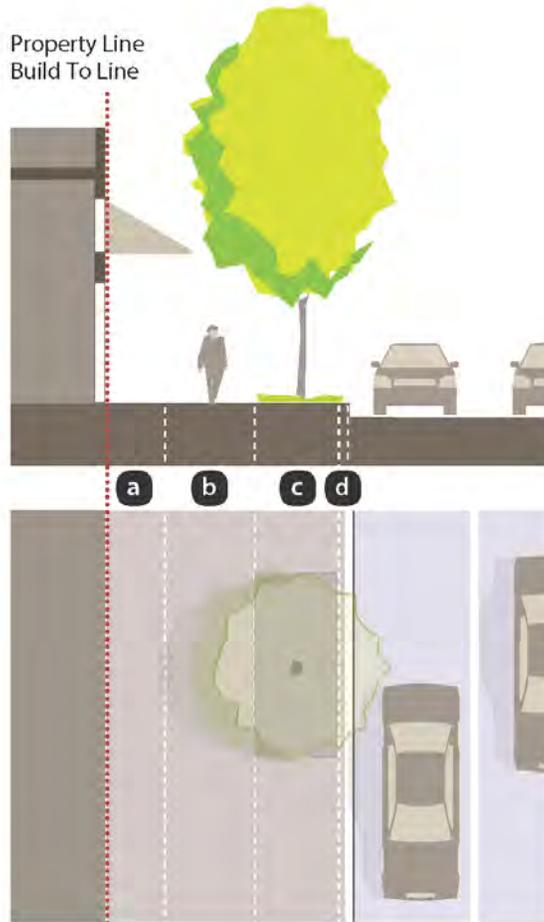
, 6th Avenue Sidewalk Improvements
